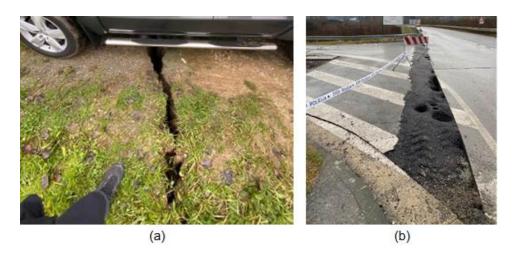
Asphalt at right-hand side abutment (a) and asphalt at left-hand side of abutment (b) of the Brest Bridge (source: Mate Baričević).
